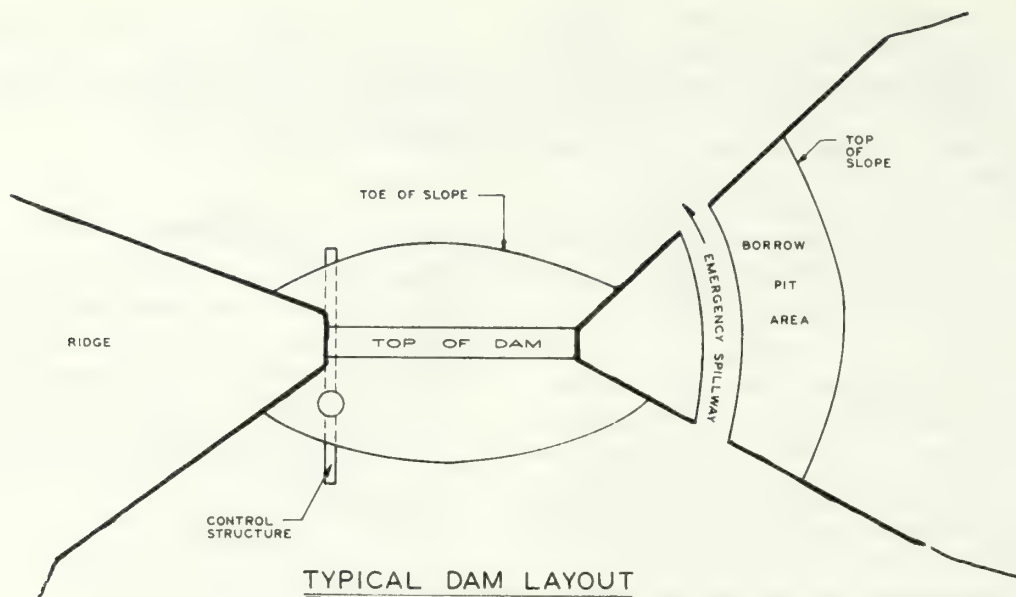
Typical dam showing borrow pit and emergency spillway.
